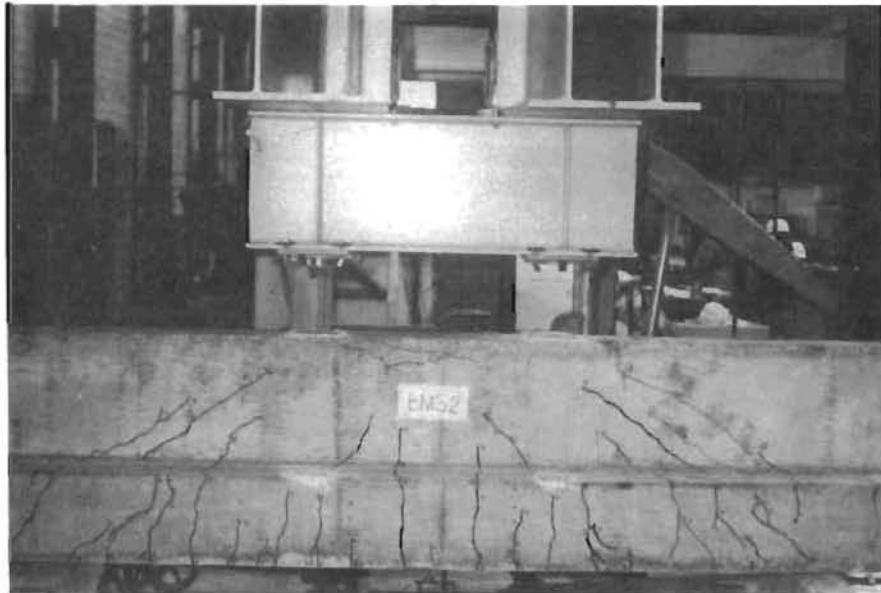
Cracking pattern and extent of cracking in specimen BMS2
